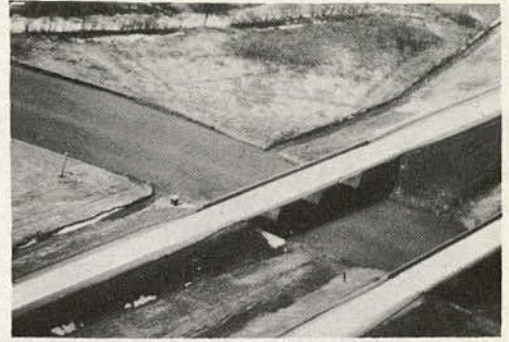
Aerial view of I-80 bridge over Bald Eagle Creek in Centre County. Upper deck is instrumented; instrument shack is on near creek bank just above bridge.
